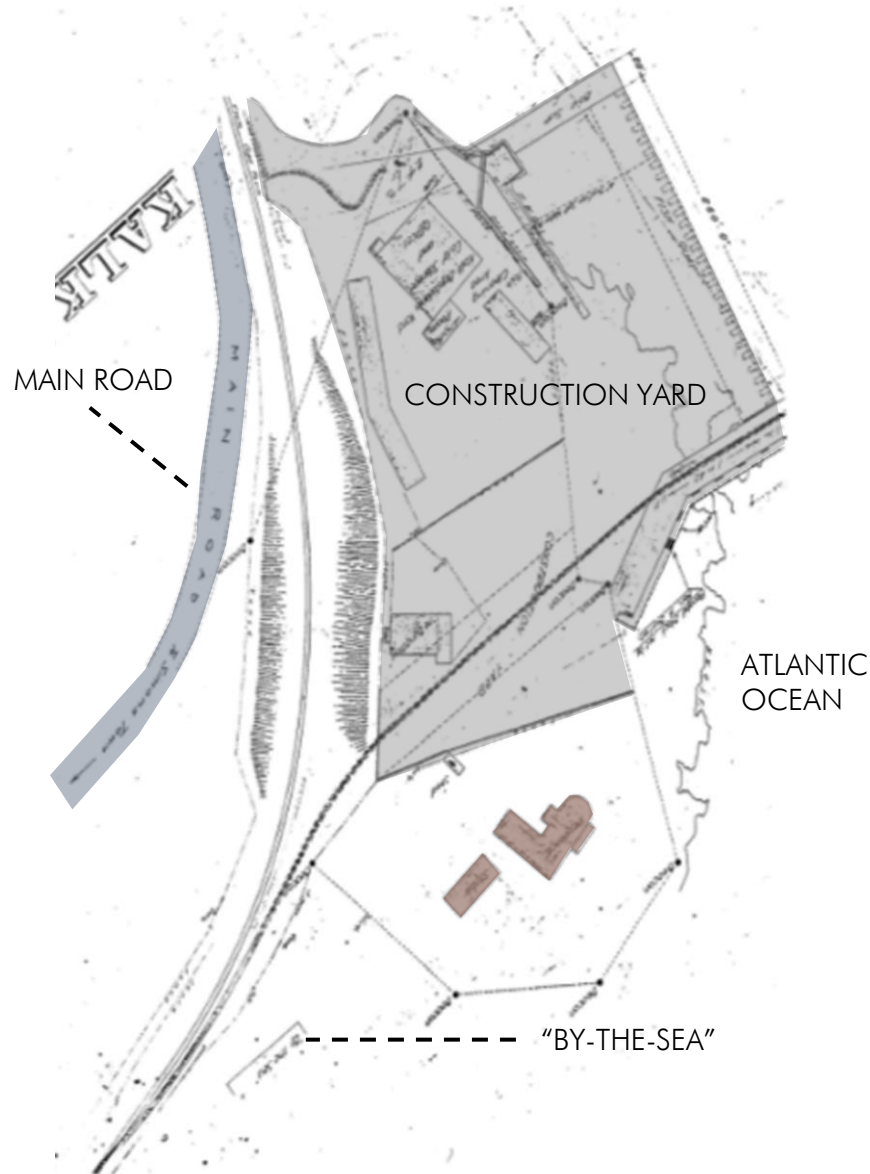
Plan of construction yard and other elements (Gasson, 2002: online).
